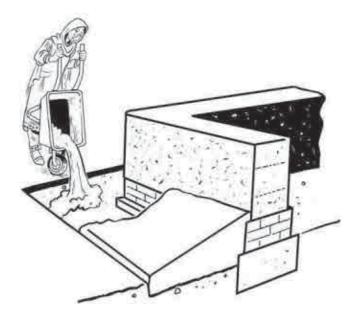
Protective 'toe' construction of lime stabilized soil or lime concrete
